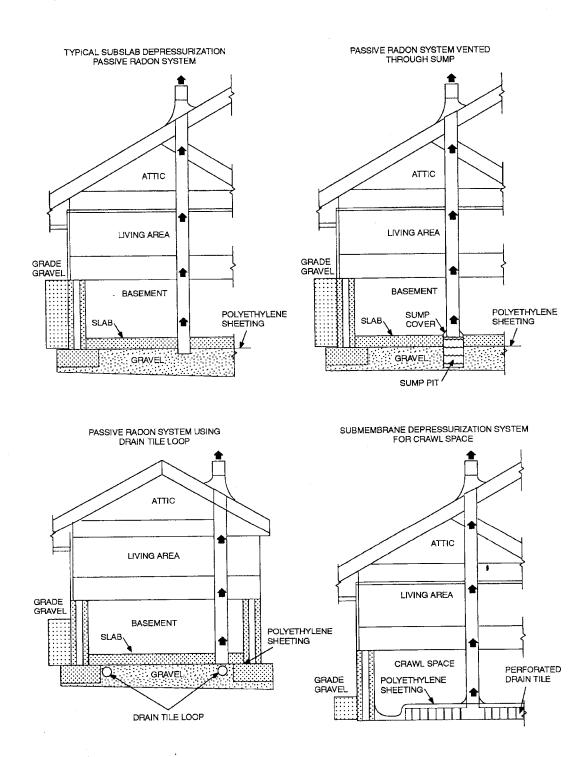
RADON-RESISTANT CONSTRUCTION DETAILS FOR FOUR FOUNDATION TYPES
